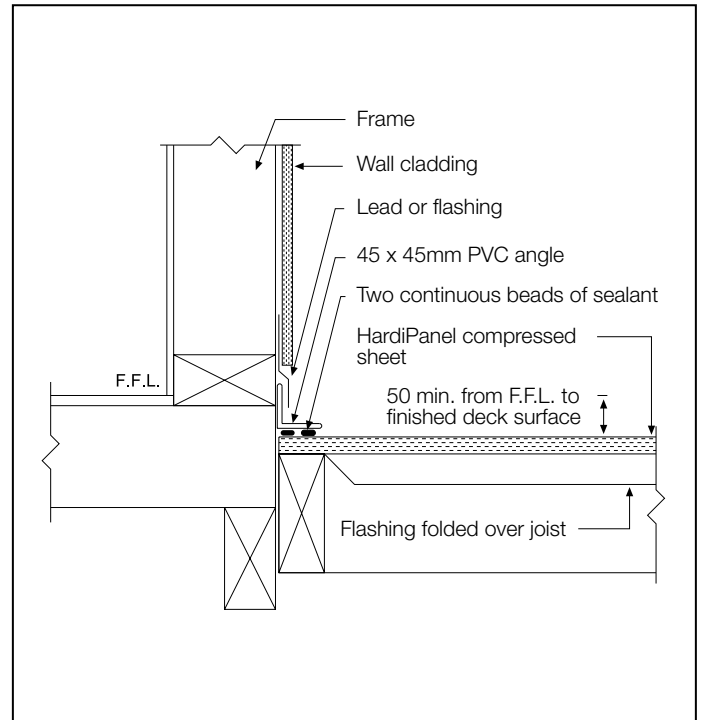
WATER RESISTANT DECK - WALL FLASHING, LIGHTWEIGHT CLADDING DETAIL
